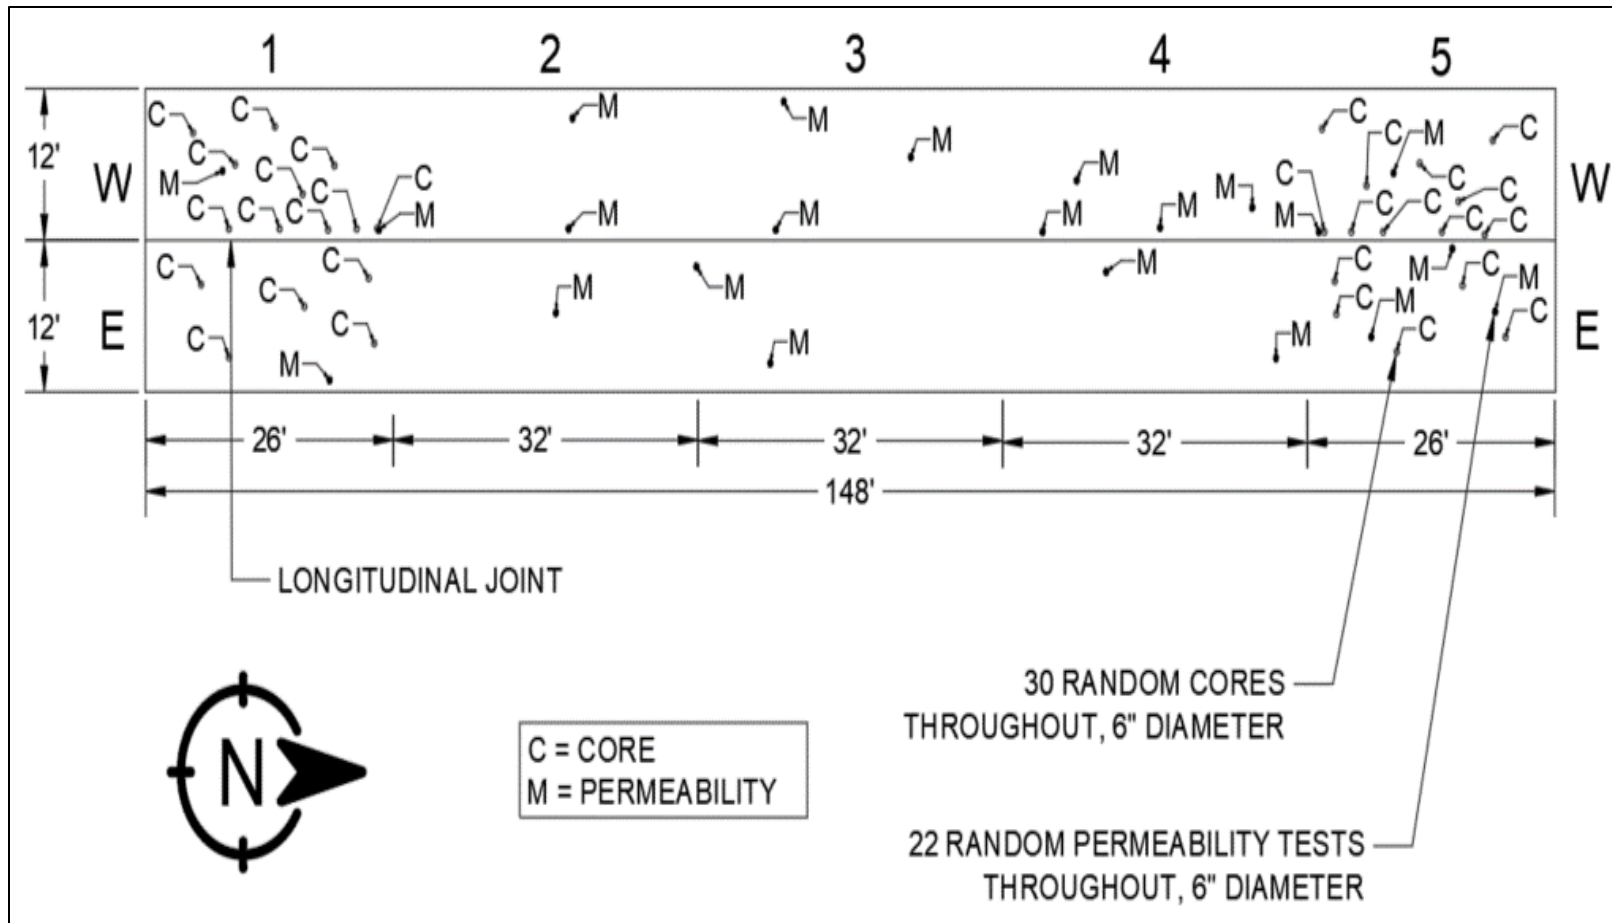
Coring and permeability testing plan (“ corresponds to inches and ‘ corresponds to feet)
